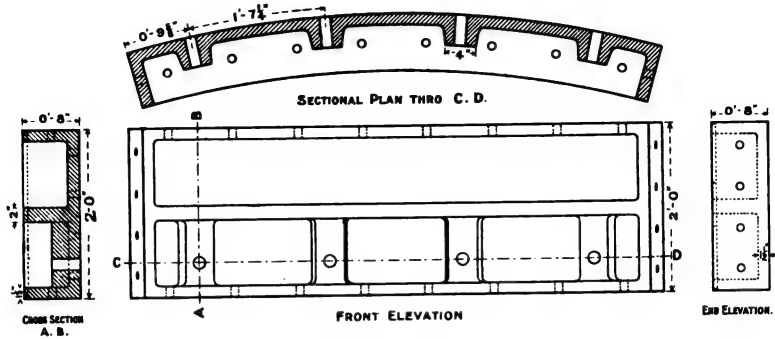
Walker's Sand Tubbing. Plan, Elevation, and Vertical and Cross Sections.
